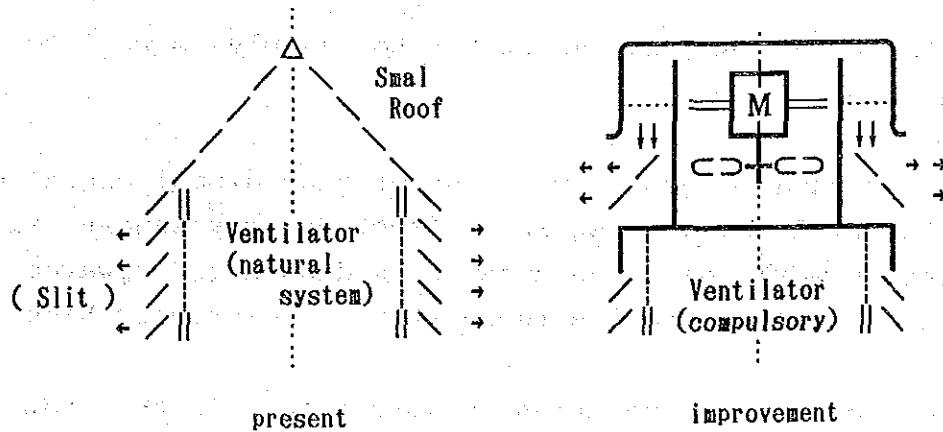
Installation Plan of Electrically-Driven Roof Ventilators
